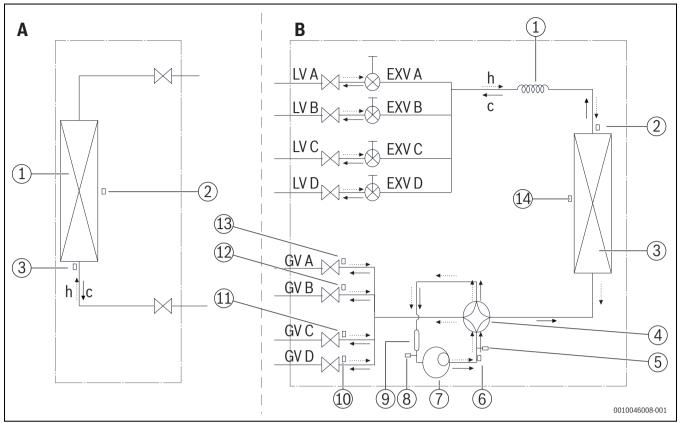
Refrigeration circuit drawing of inverter 1 drive 4 type
